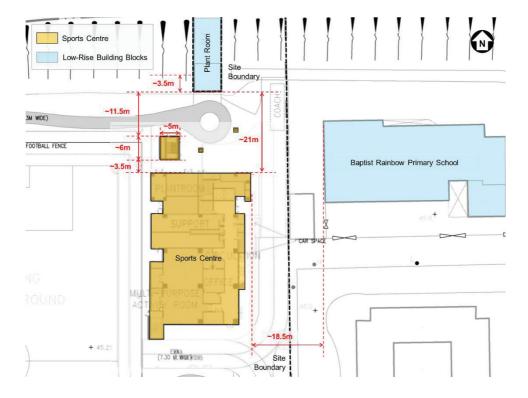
Layout Plan of Sports Centre at Ground Floor Level under <u>Proposed S16A</u>
